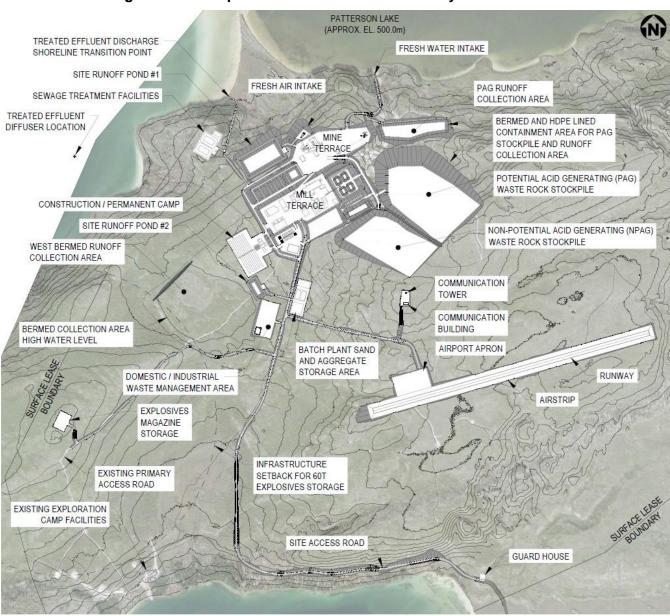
Proposed Surface Infrastructure Layout Plan
